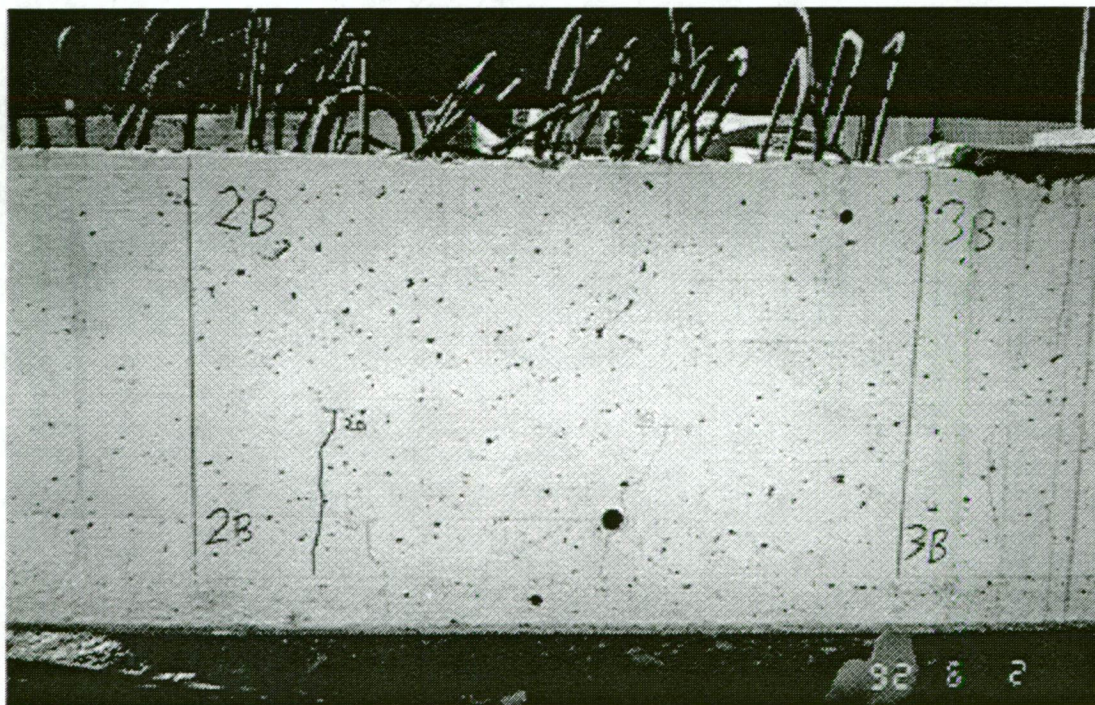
Flexural Beam Crack Patterns
